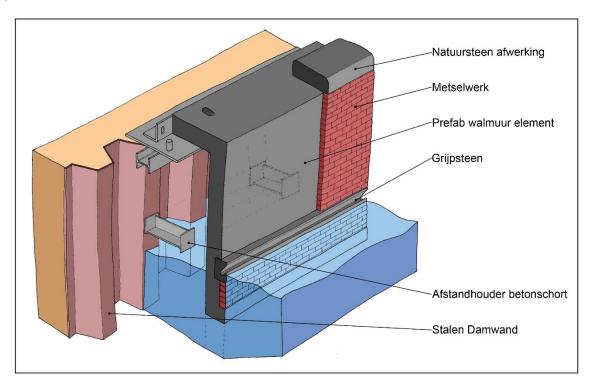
Quay wall renovation for Rechtboomsloot in Amsterdam, redrawn image not on scale
